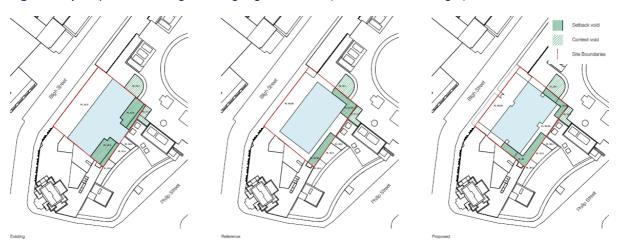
| Proposed building massing – top of podium (Source: Woods Bagot)
